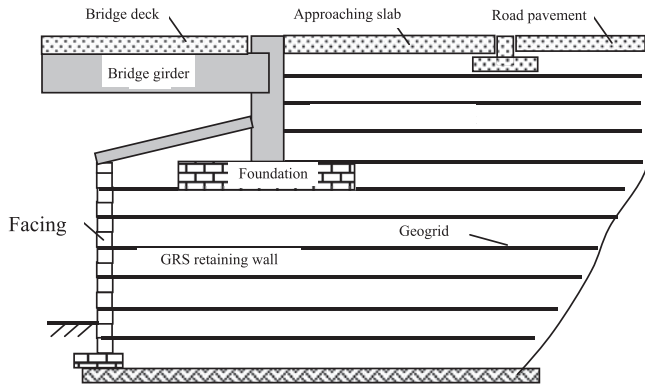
Typical cross section of a GRS bridge abutment (modified from Abu-Hejleh et al., 2000).
